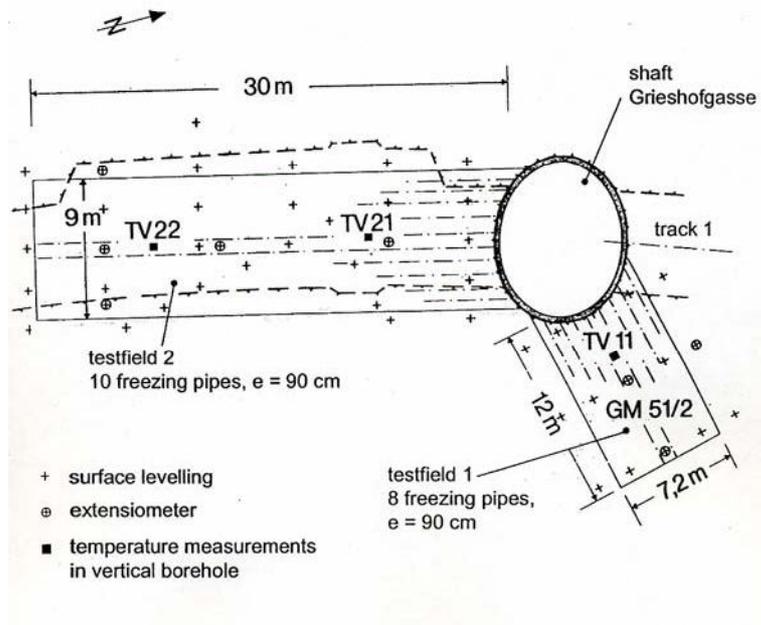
Layout of test fields, construction lot U 6/3, subway Vienna (after Arz et al., 1988)
